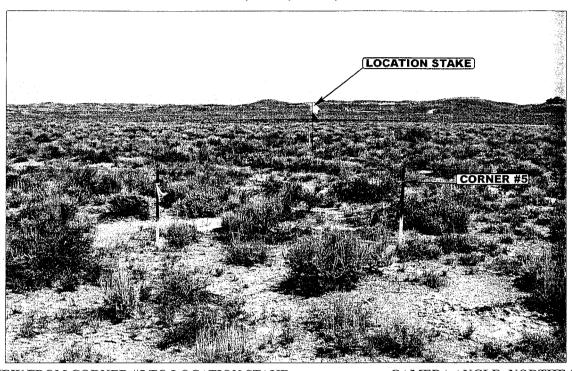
PHOTO: VIEW FROM CORNER #5 TO LOCATION STAKE
